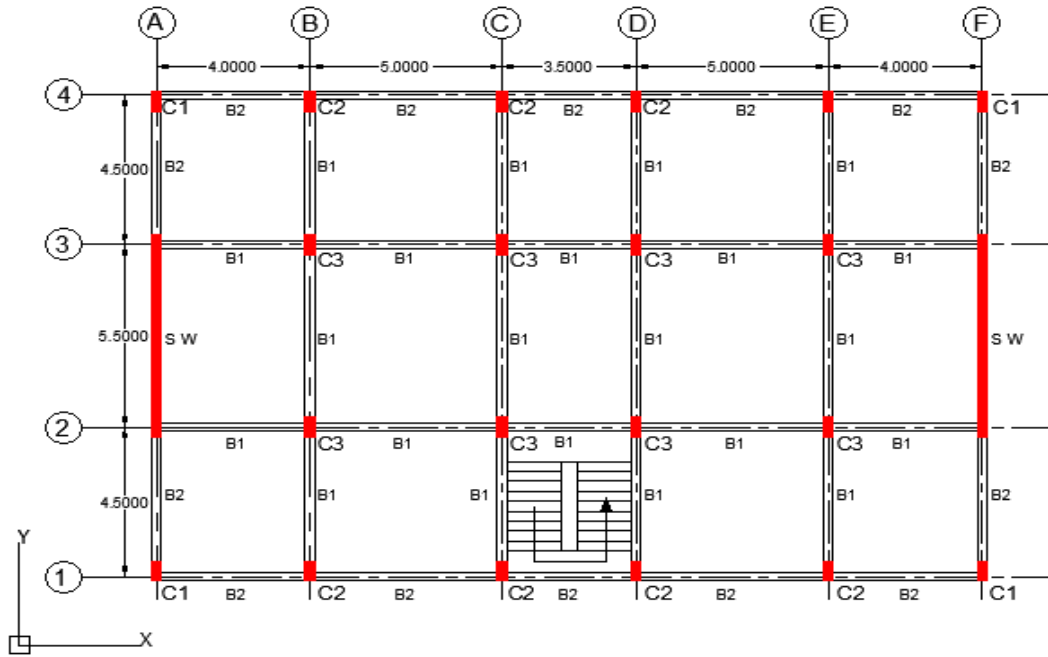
Floor plan for five story moment-resisting frame with shear wall in regular form
